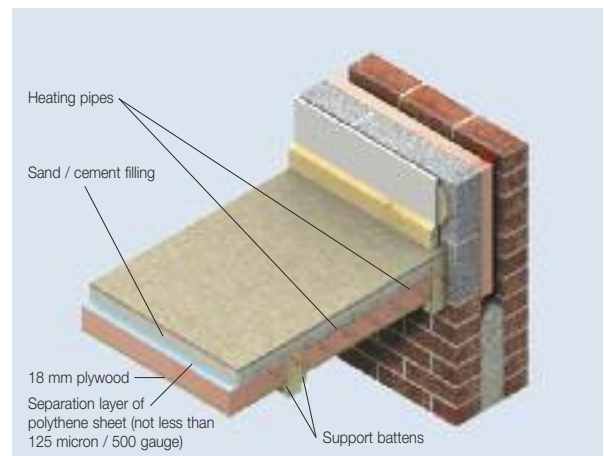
Intermittent Heating Applications – Suspended Timber Floor
